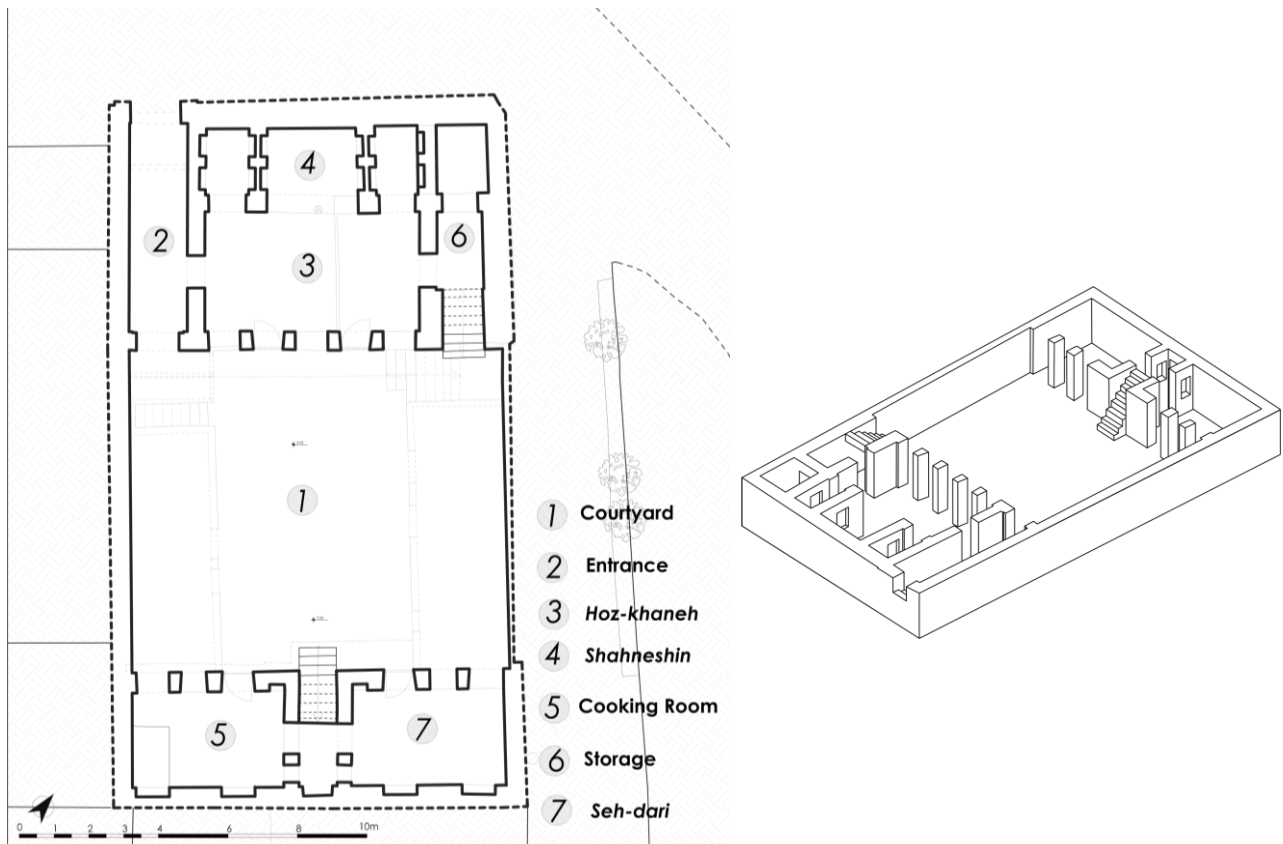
The original plan of the ground floors of two building masses and identification of earlier spaces.
